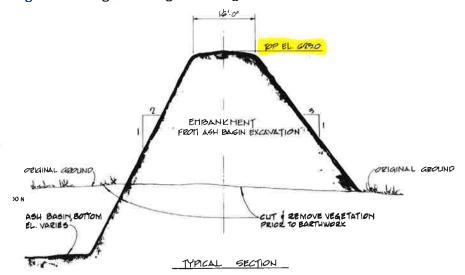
Original Design Drawing Cross-Section of Landfill Perimeter Embankment
